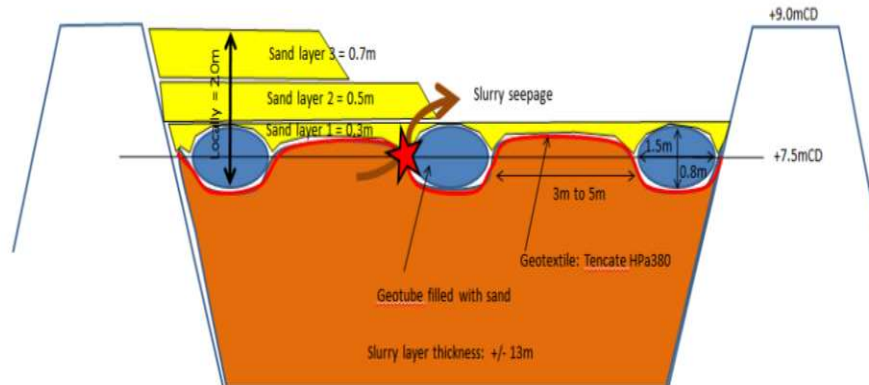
Accelerating the placement of the third layer of sand could have resulted in large deformation and stress build up in the geotextiles leading to its failure
